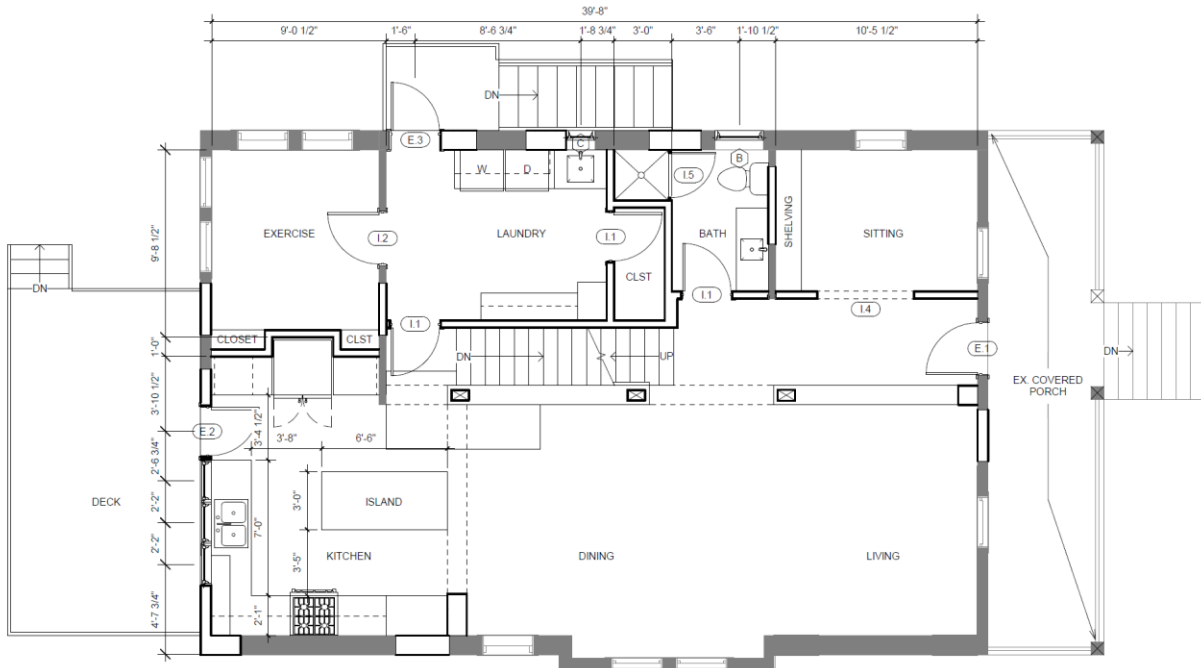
The approved 1st-floor plan from the 8/17/2022 HAWP.
